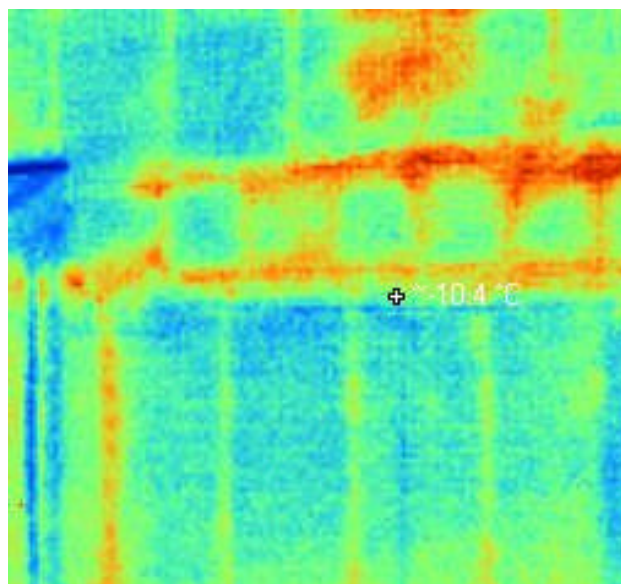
Infrared photo of the wall of a conventional home. Note the red spots indicating heat loss at the rim joist area. The house has two storeys.
